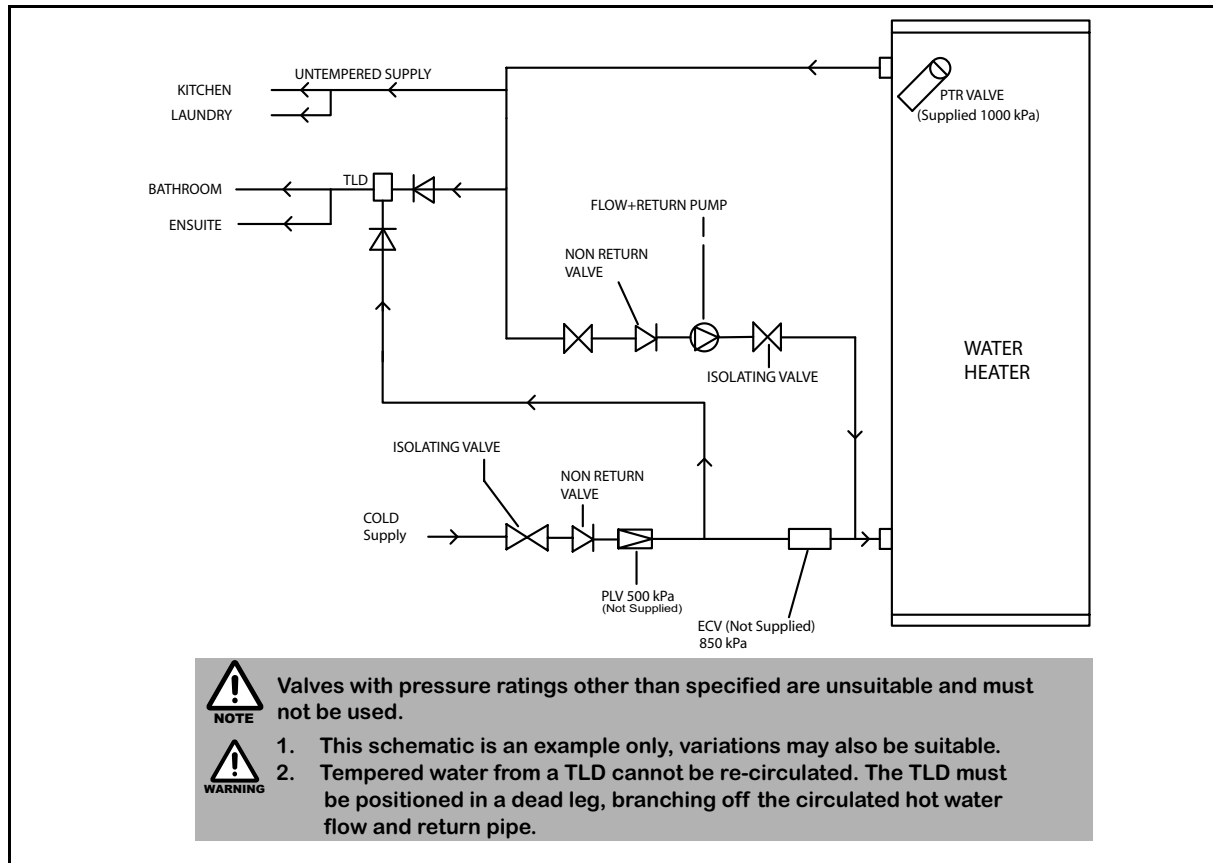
Hot Water Plumbing System Example with Flow and Return Pipe Work and TLD
